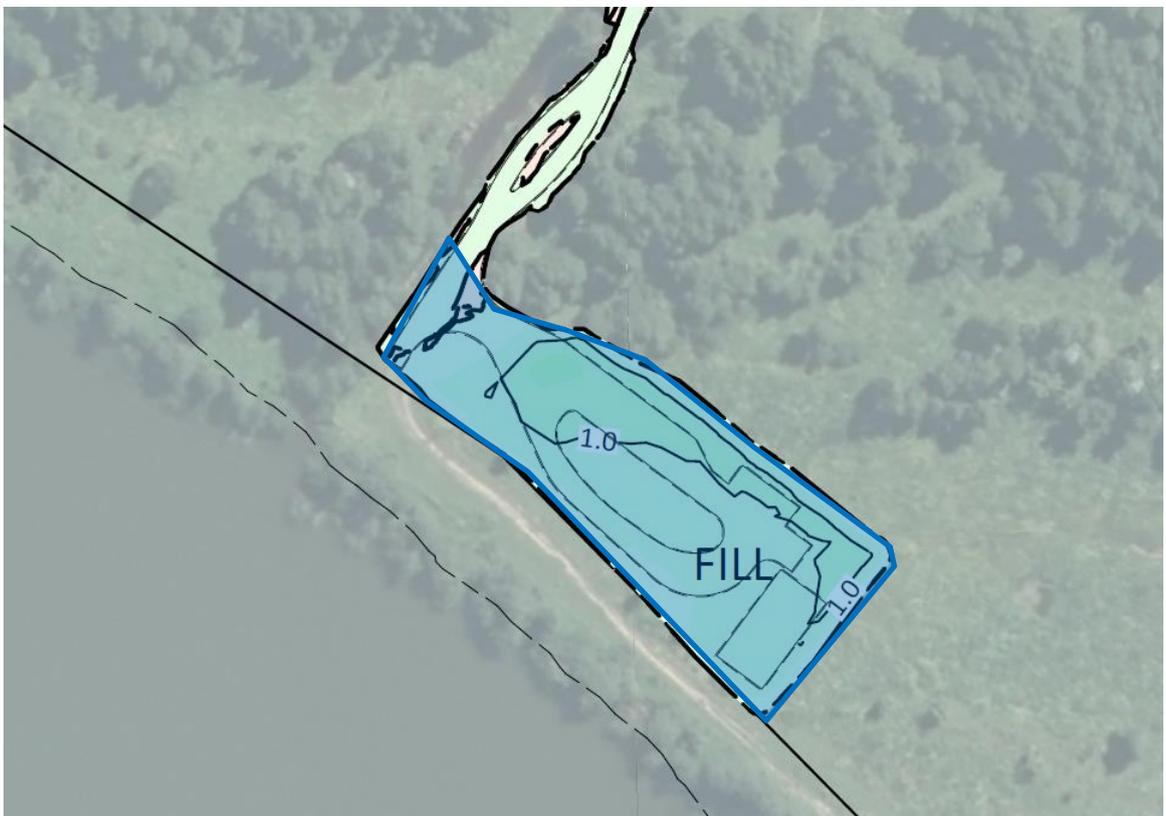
Cut fill plan of RC4-A showing fill works with area recommended for spot checks during topsoil stripping outlined and shaded in blue (source: Civil Plan Ltd)
